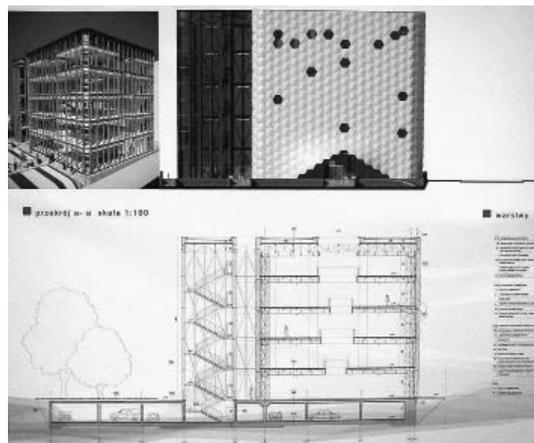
Diploma design 1 – view, elevation with individual cladding panels and section.
